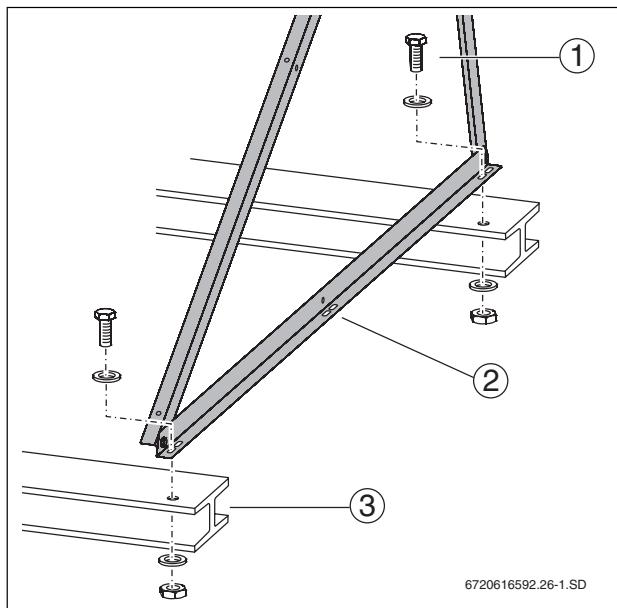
Installation, e.g. on I-beams (provided on-site)
